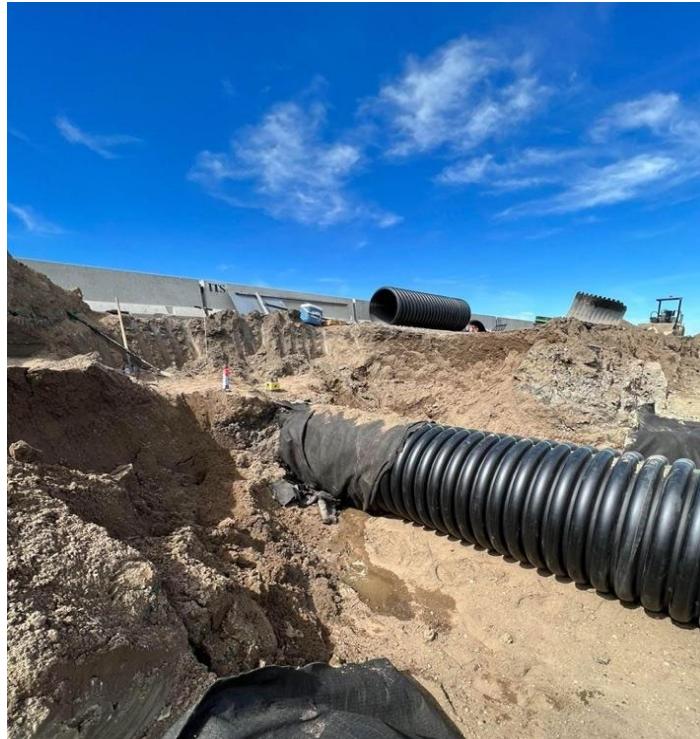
Split coupler joining pipe underneath westbound lanes to that previously installed underneath eastbound lanes
